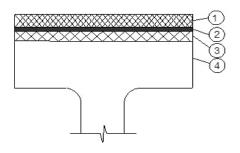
The proposed design of the roadway with the laying of an aluminum sheet between the layers of asphalt concrete pavement (option 2): 1-top layer of asphalt concrete pavement; 2-waterproofing (aluminum sheet); 3-lower layer of asphalt concrete pavement; 4-plate main beam
